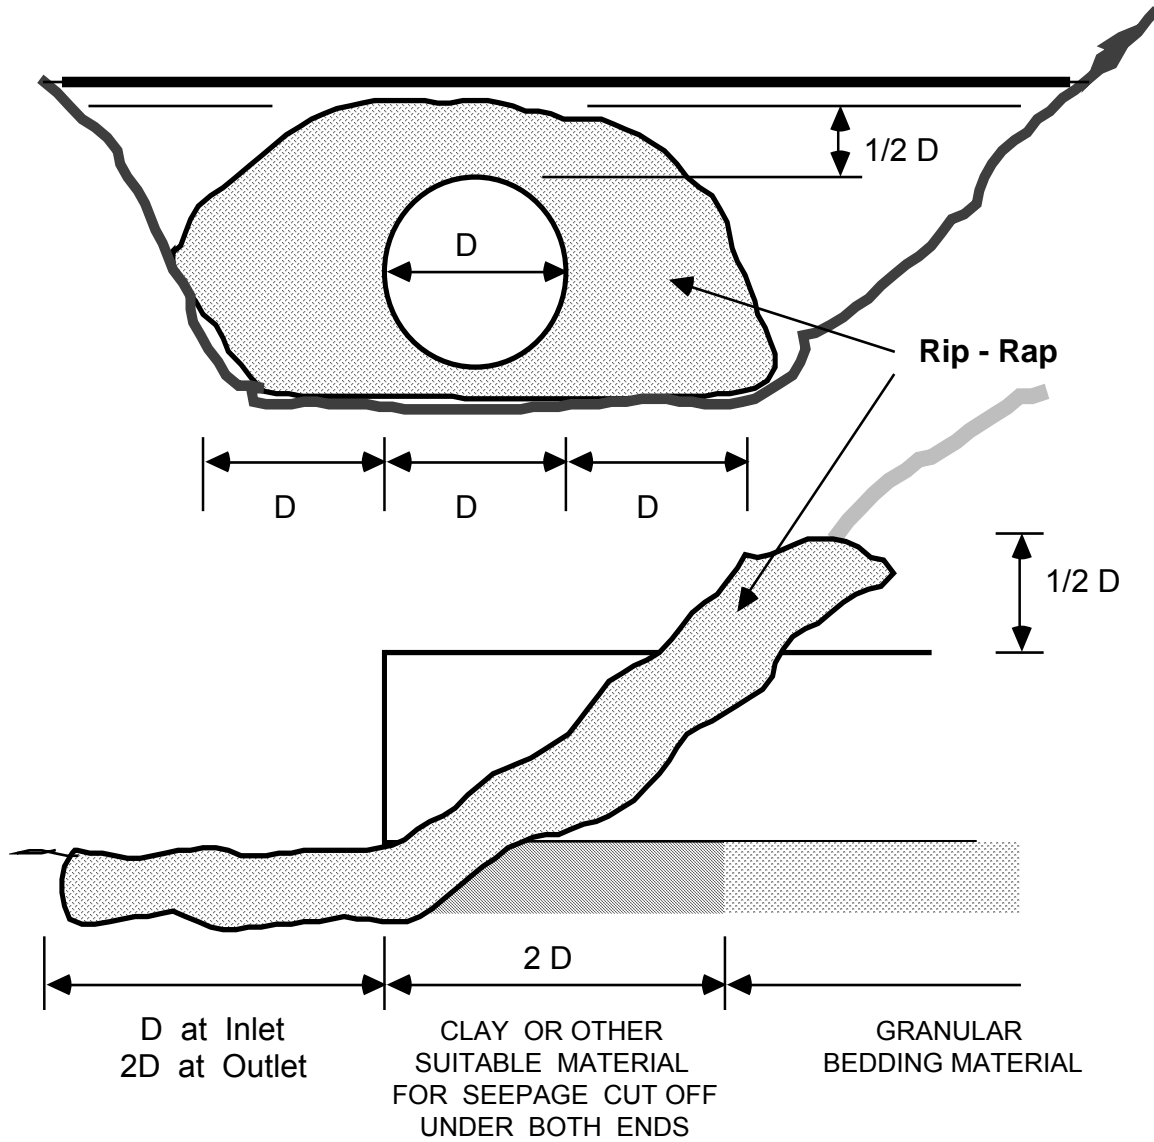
Inlet and outlet protection of culvert with rip-rap. Rocks used should typically weigh 20 kg or more and approximately 50 percent of the rocks should be larger than 0.1 m^3 in volume. Rocks can also be replaced with cemented sand layer (1 part cement, 4 parts sand).
